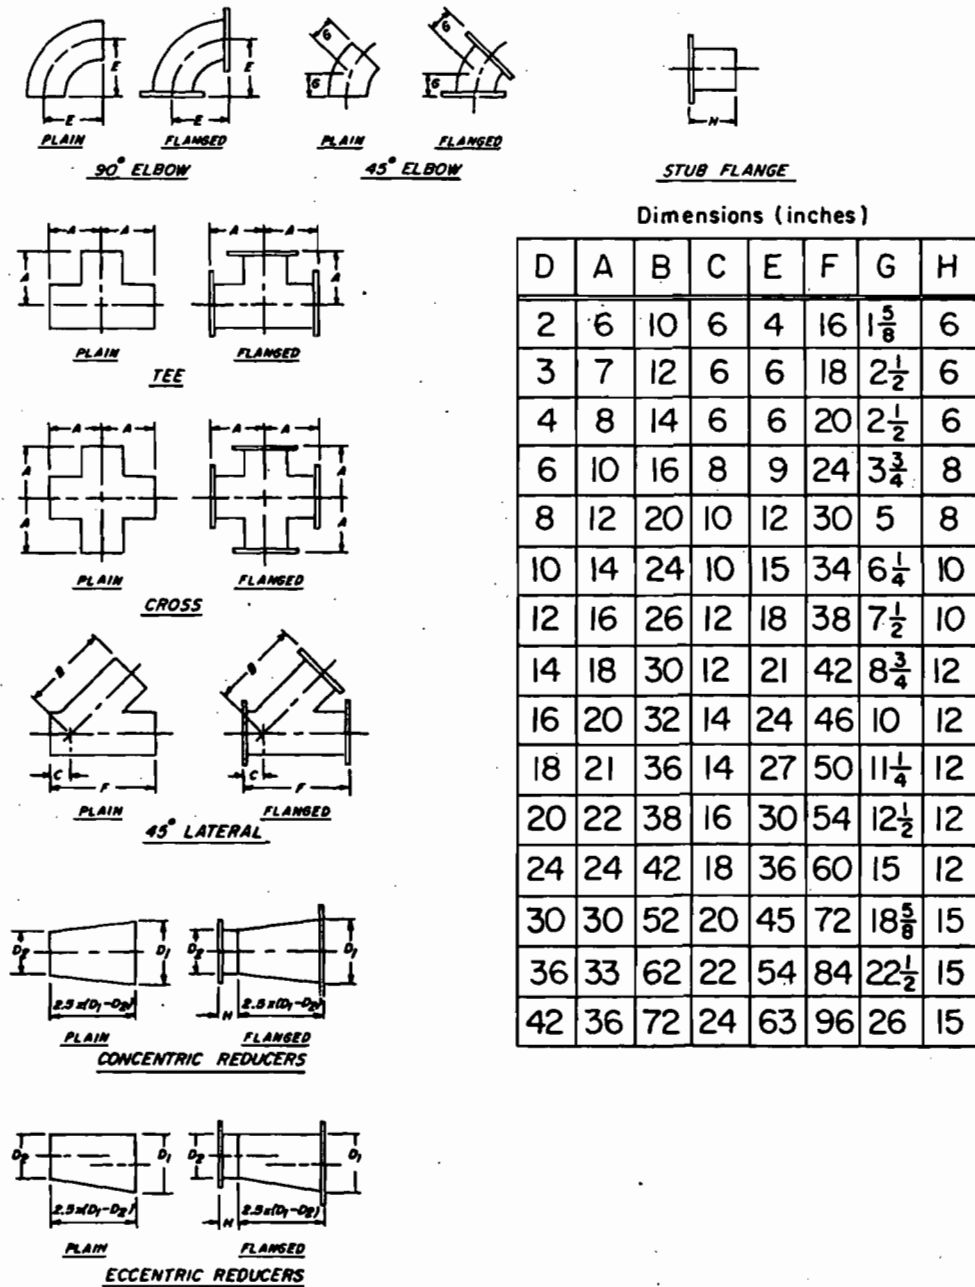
Dimensions of reinforced-polyester pipe fittings.
